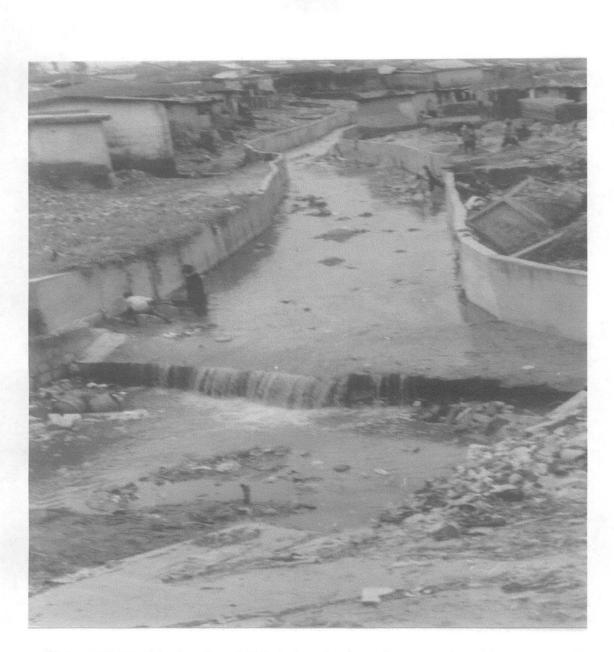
Dawak Junction / U.B.A Road Water Channel, Drainage Banks not fully sandfill creating another vacuum for water pool.
